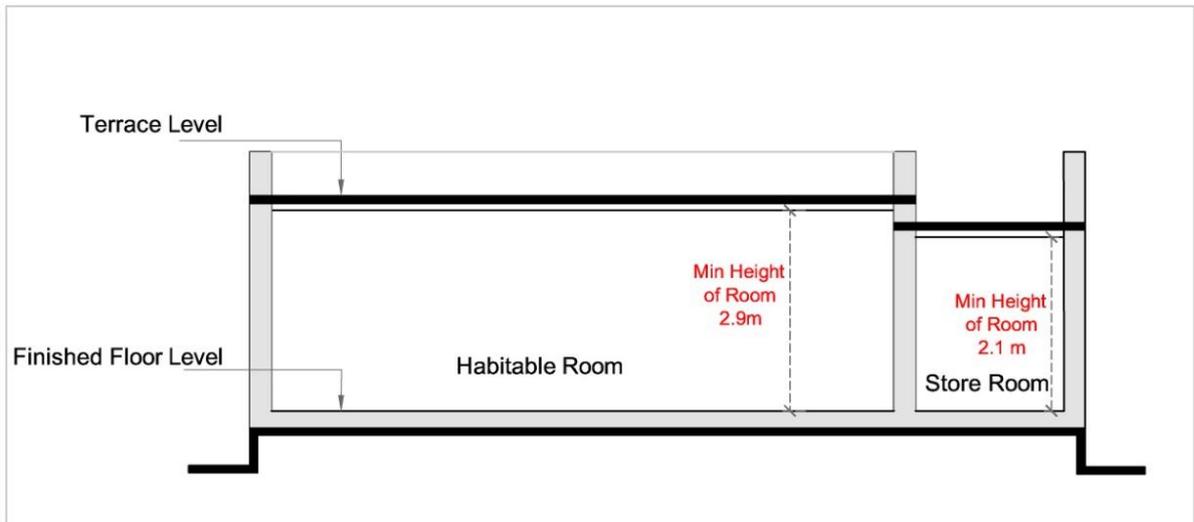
Minimum Clear Height for Dwelling Unit / Commercial Building
